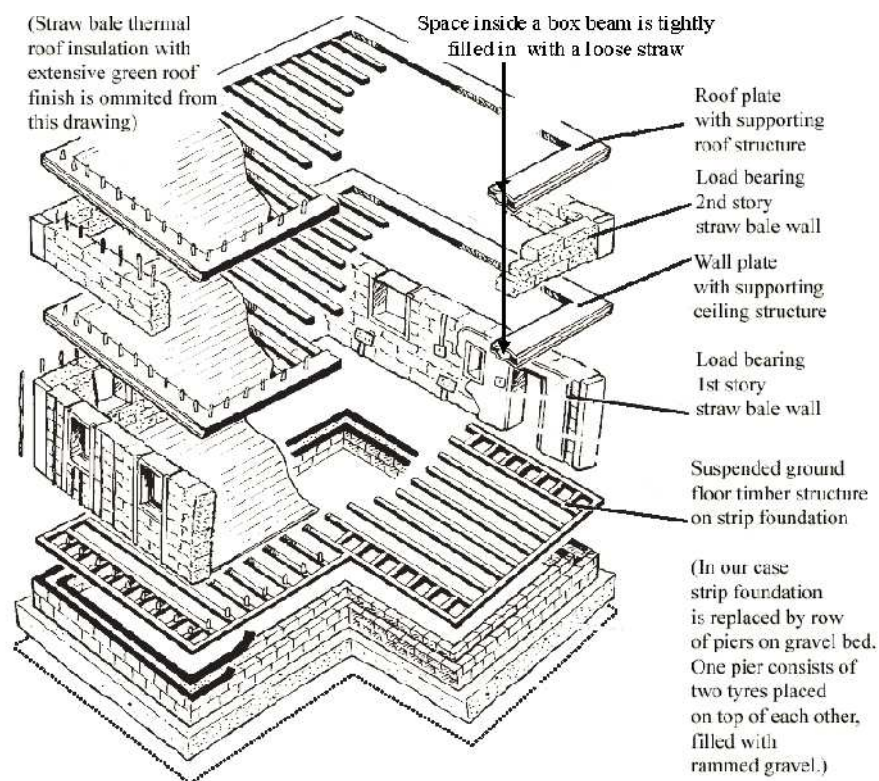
Sketch of double story load bearing straw bale construction, which has been adapted for this essay from Amazon Nails (2001).
